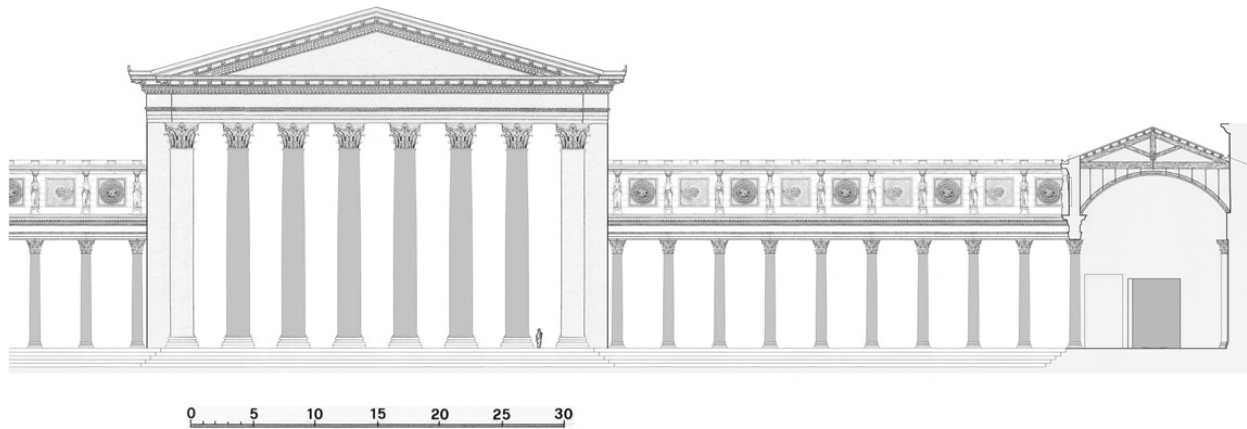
Elevation of the axial hall and of the southeast portico of the *Templum Pacis*, with a section of the southwest portico (author's drawing).
